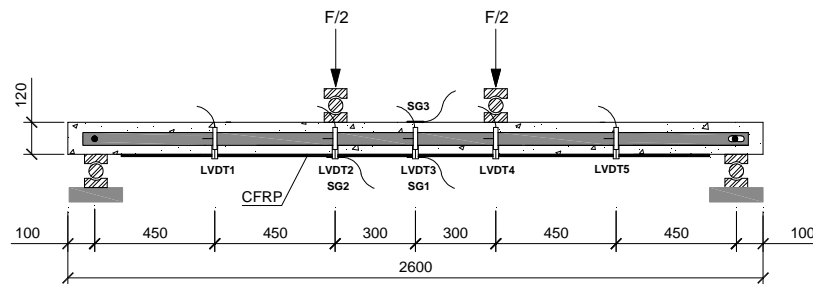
Specimen's geometry and test setup. Note: all units are in millimeters.
